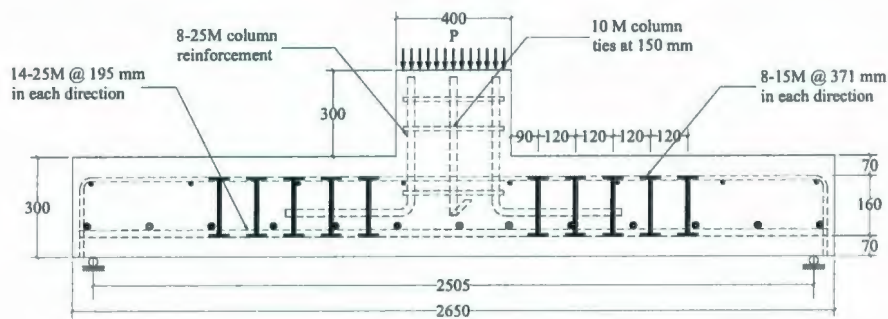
Details of typical test specimen HS7 ( $h = 400$  mm)
